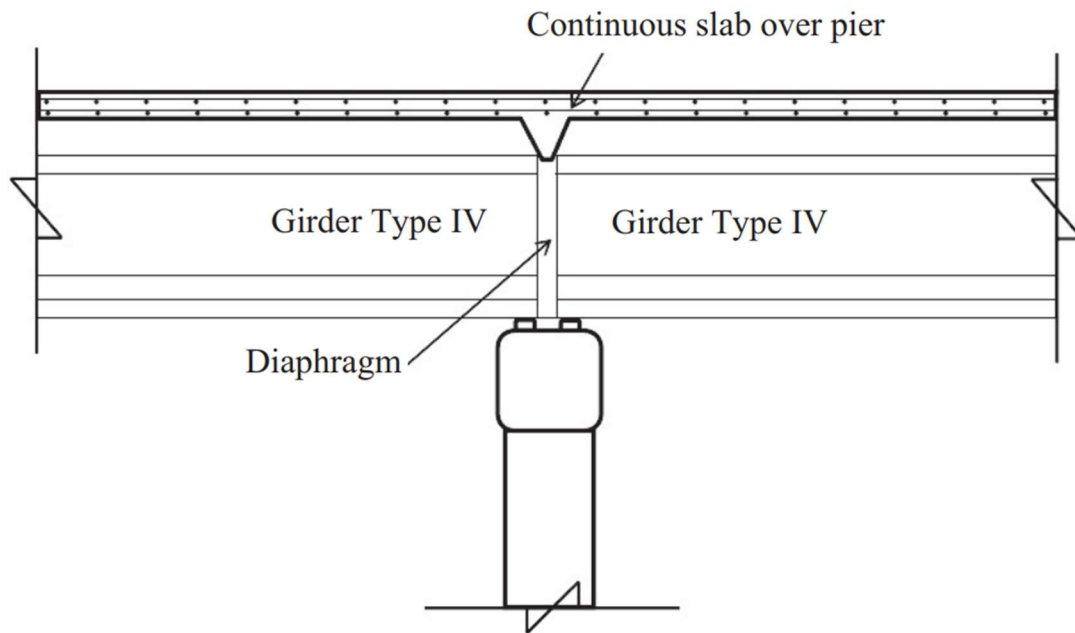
Typical continuity joint between girders (Eamon Et. al., 2016).
